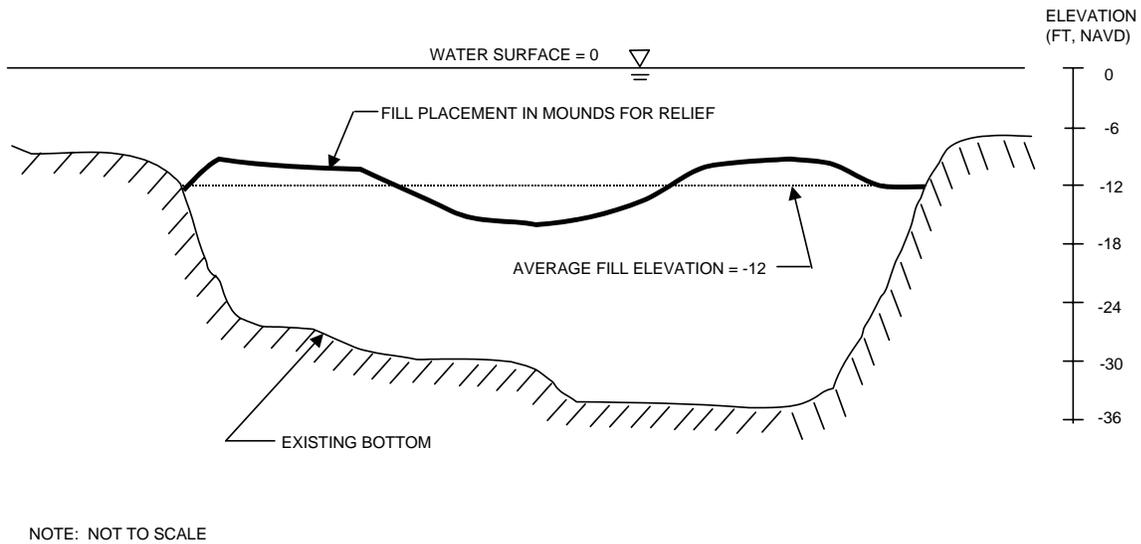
Schematic Cross-Section for Filling of Dredged Hole #6 to -12 ft.
